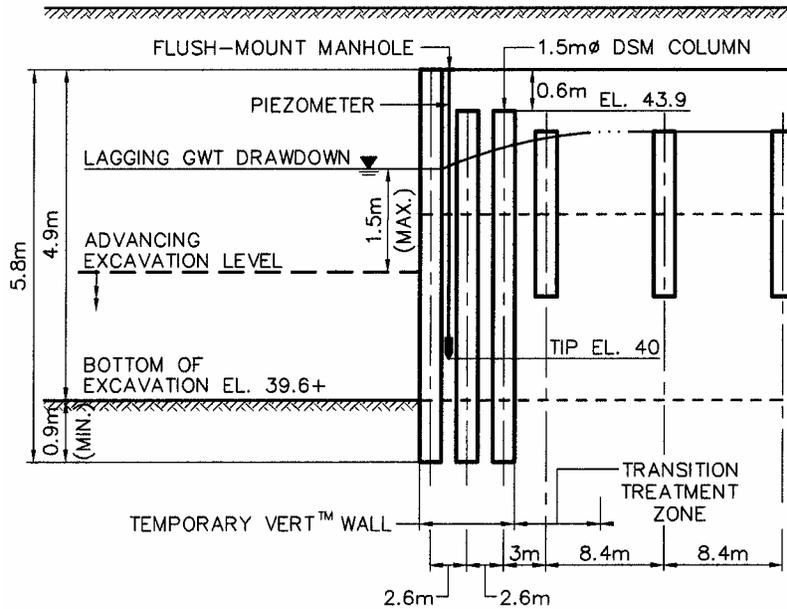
A Cross Section of Soil Cement Columns and VERT Wall Lakeland – Polk County, Florida
